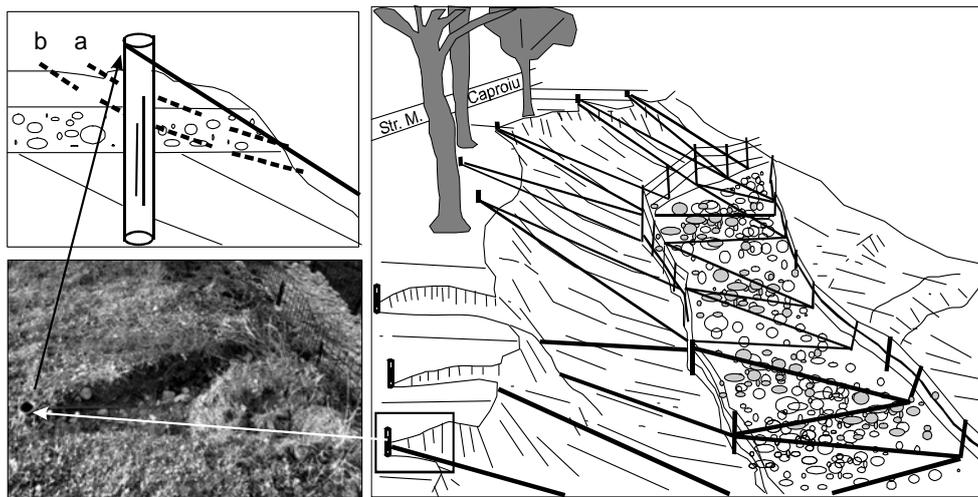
Landslide A3, reactivated by the “supporting walls” and anchor straps. “a” and “b” are ditches deepening very fast by washing processes
